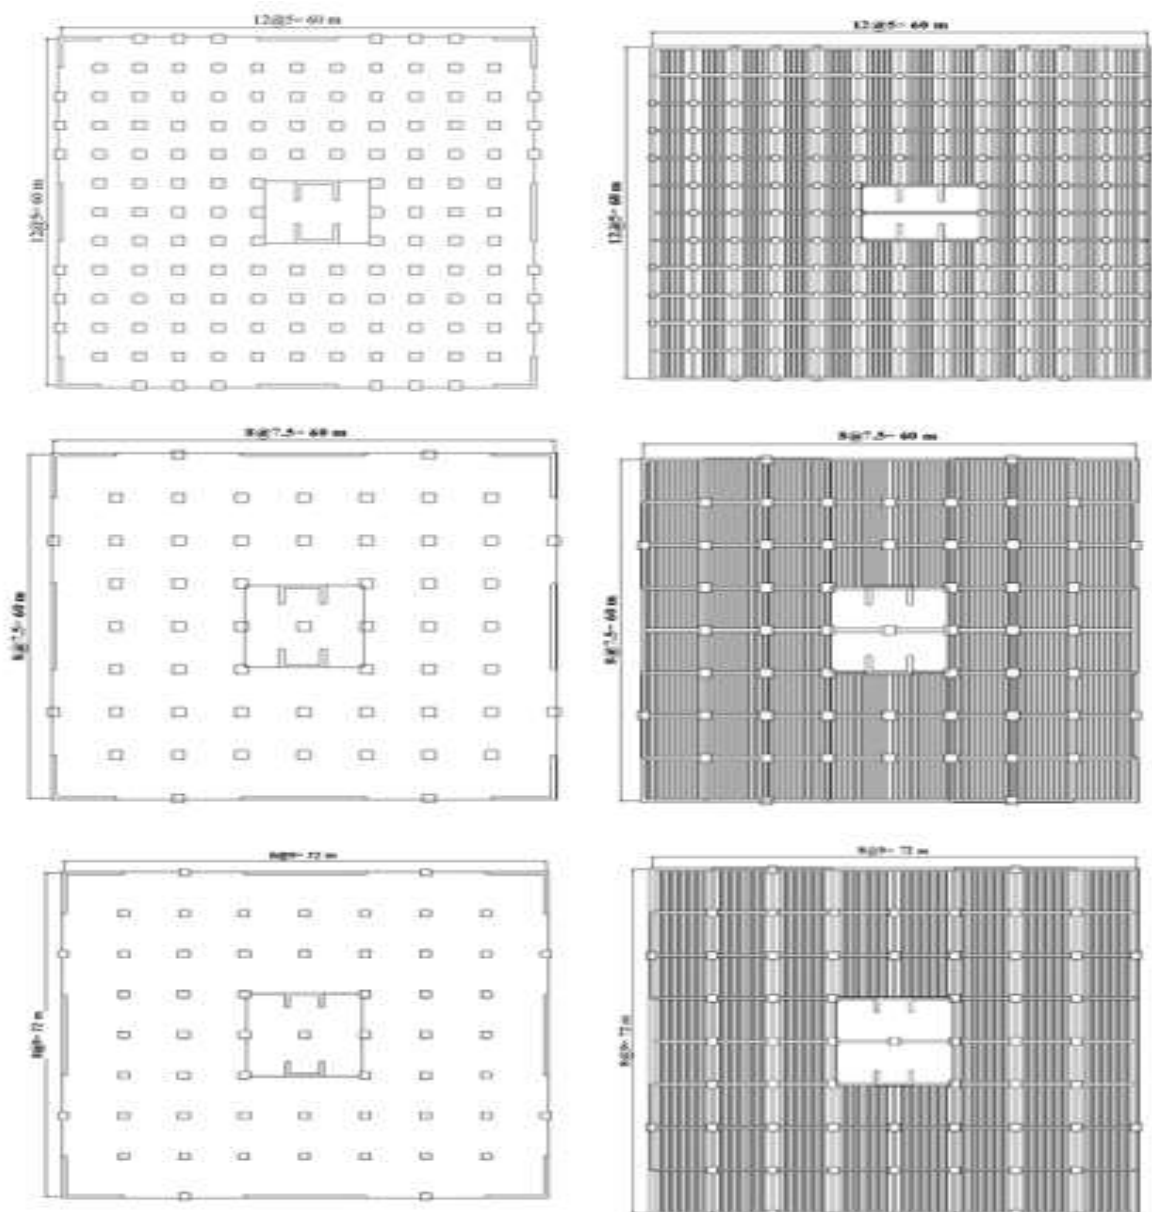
floor layout for 10 ,15 and 20 story with Flat slab and Hollow block slabs
